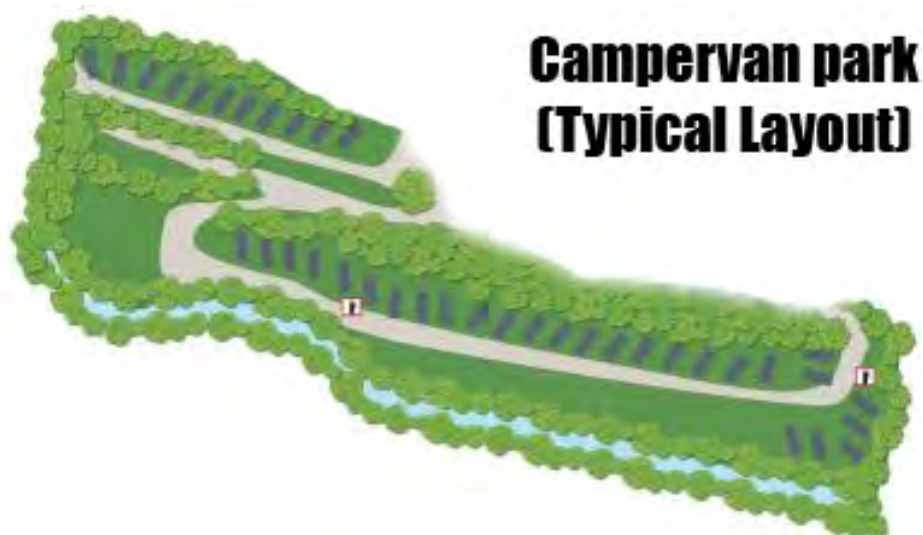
Example of Typical layout of campervan park, with staggered layout among the trees.
